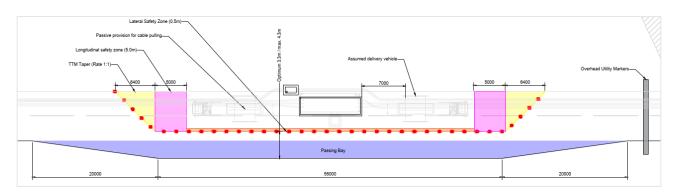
Proposed Traffic Management and Passing Bay Arrangement for a Joint Bay in the Roadway (Indicative Layout)
